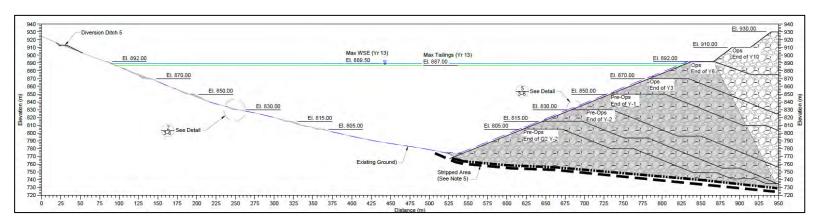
Cross Section of the TMF and Raises to Final Design Evaluation
